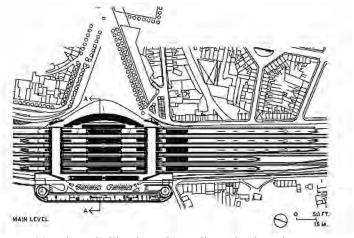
Liege-Guillemins TGV Railway Station Plan. http://archrecord.construction.com/projects/bts/archives/transportat ion/10_TGV_Railway_Station/default.asp?bts=TR
